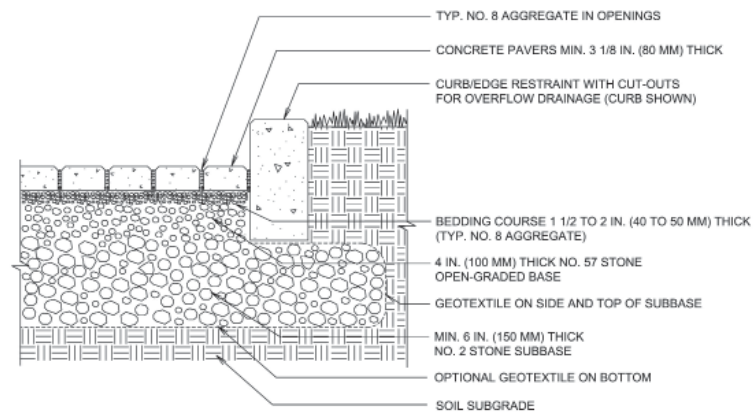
A cross-section detail from a permeable pavement system. This design allows for infiltration to the soil subgrade. (Source: Aquafor Beech)
